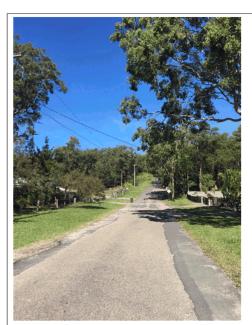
Existing condition of Clark Street looking towards Gan Gan Road.
